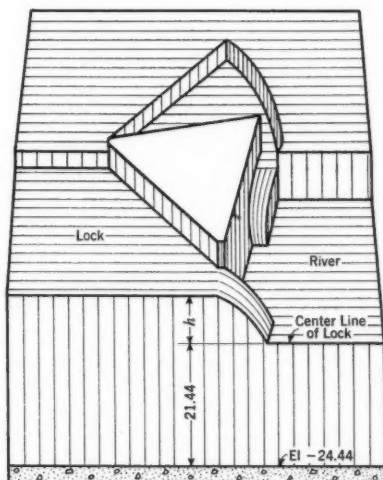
LONGITUDINAL CROSS SECTION OF LOCK
